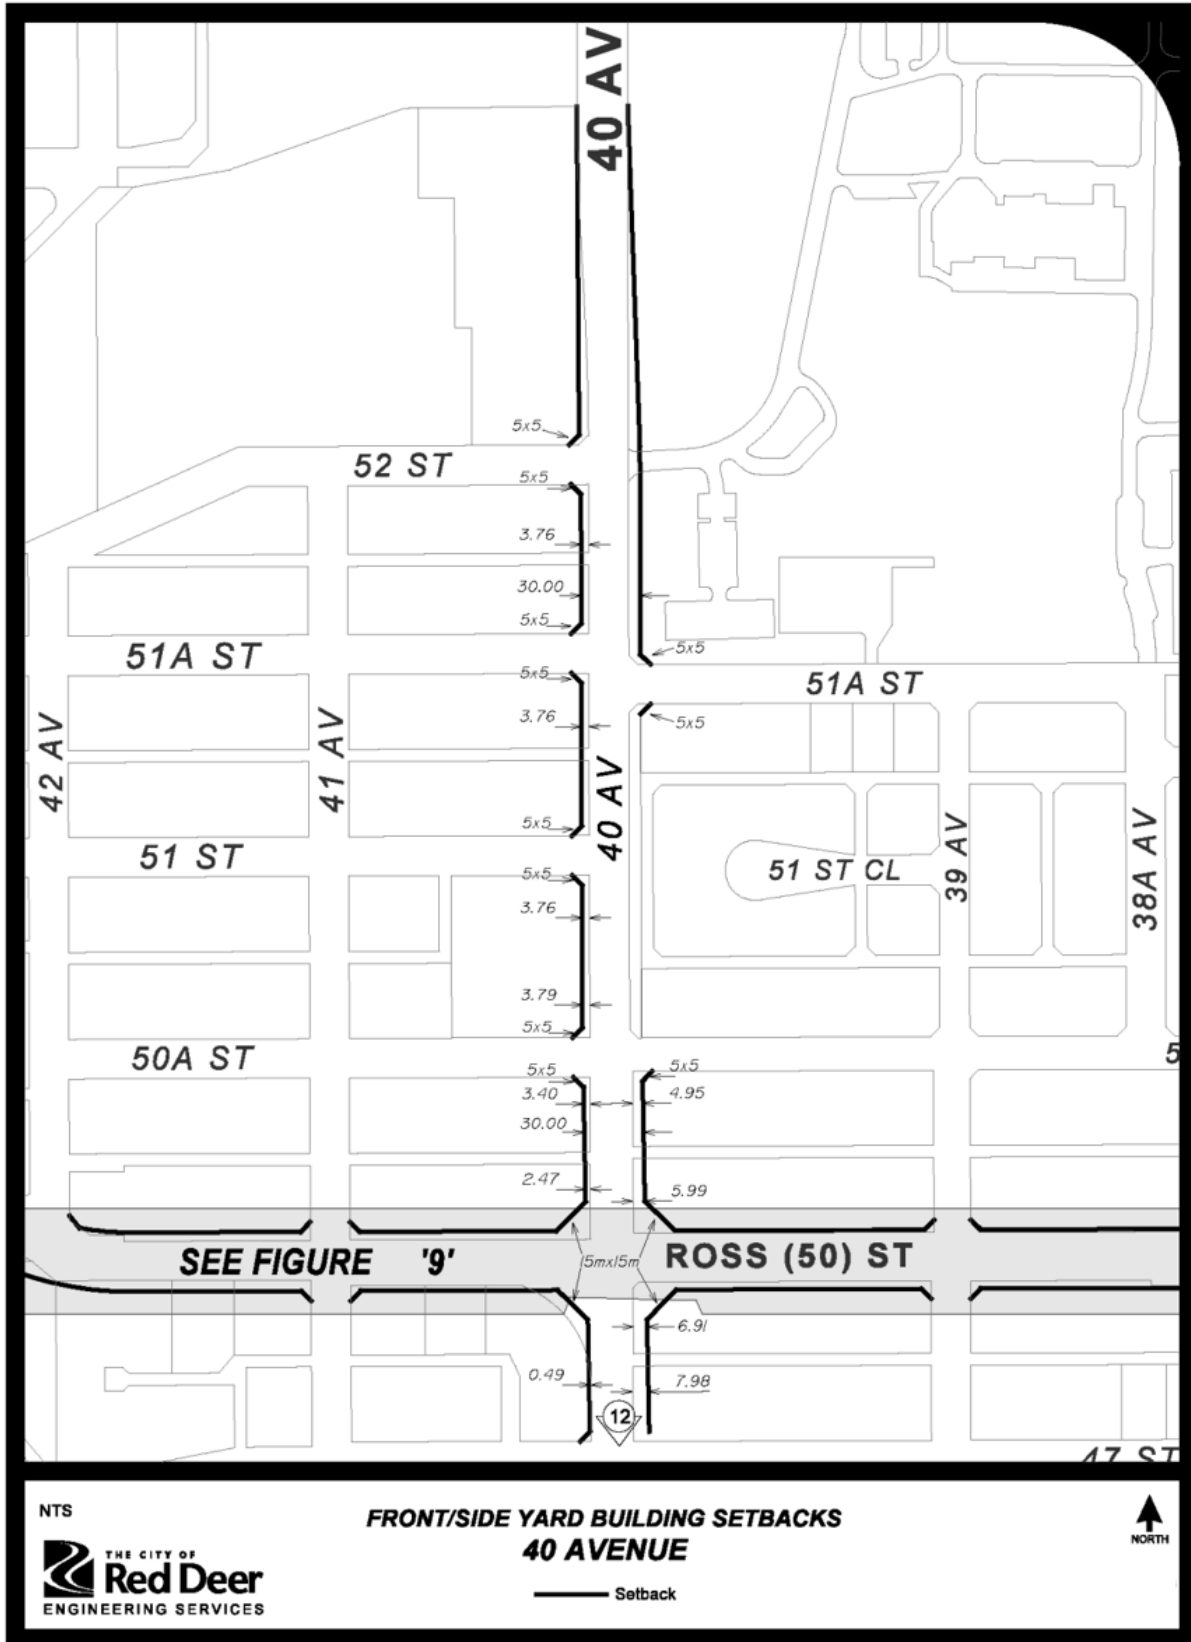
Front and Side Yard Building Setbacks - 40 Avenue (1)
